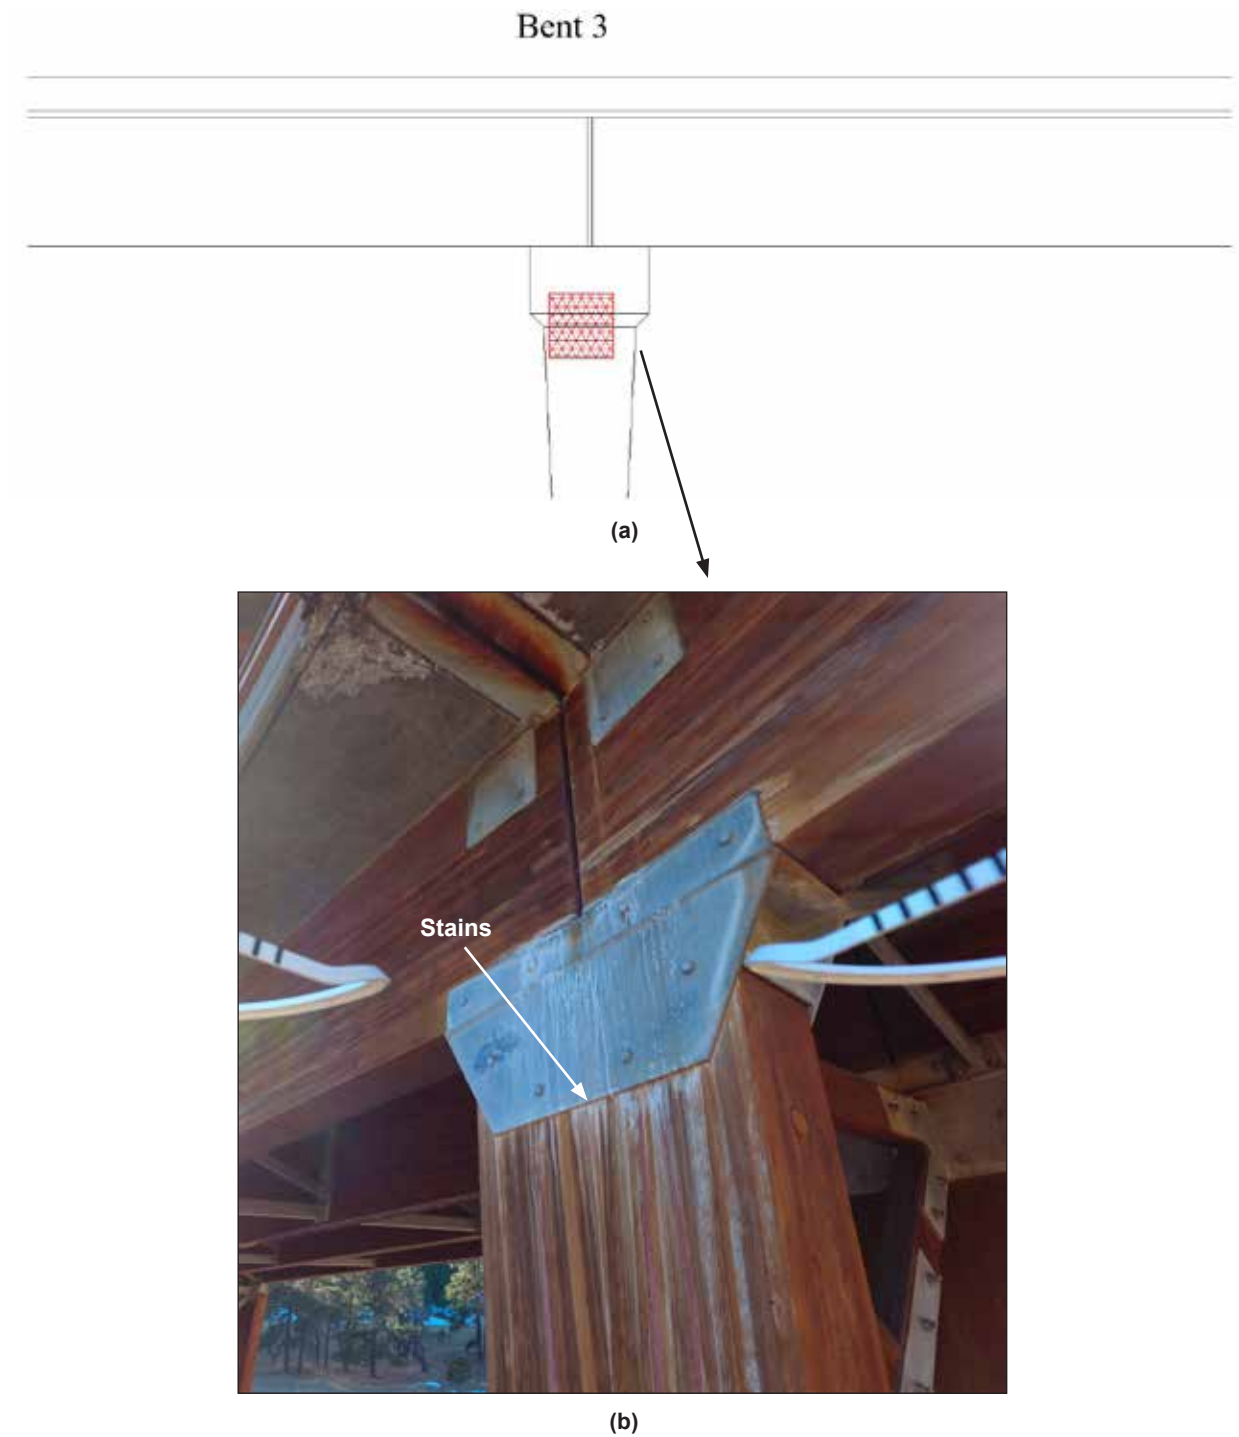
Sample column damage: (a) damage location; (b) stains on top of Column 4 at Bent 3.
